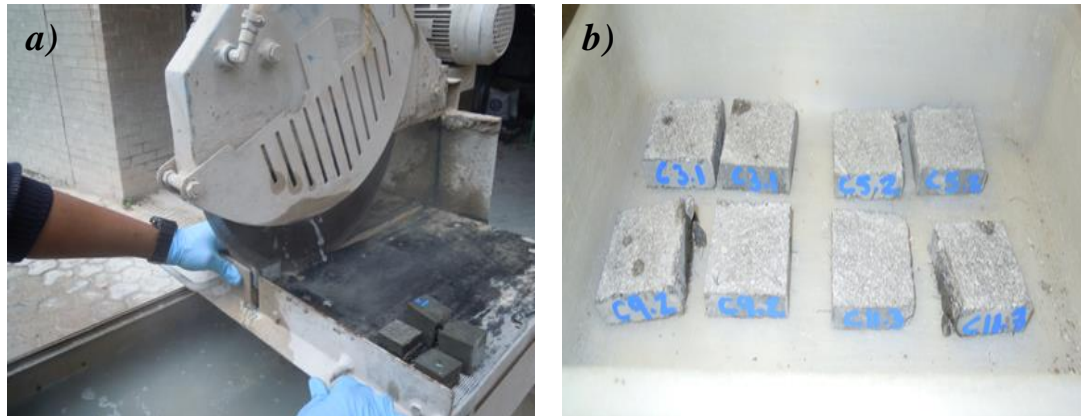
Preparation of the specimens: a) cutting of the 1-cm thick slices and b) 2 pieces of each specimen for the inspection.
